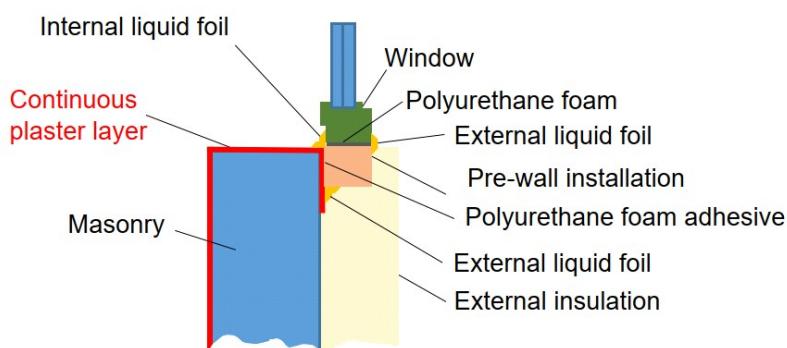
For airtight installation of the window frame, the interior plaster must be connected to the front-of-wall installation system without interruption (Fig schematic).
